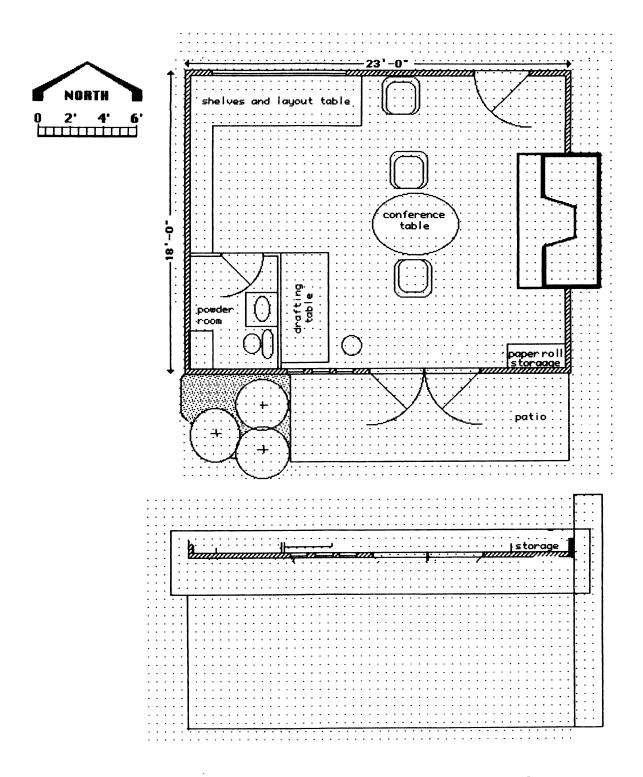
An elevational drawing is drawn from the floor plan.
